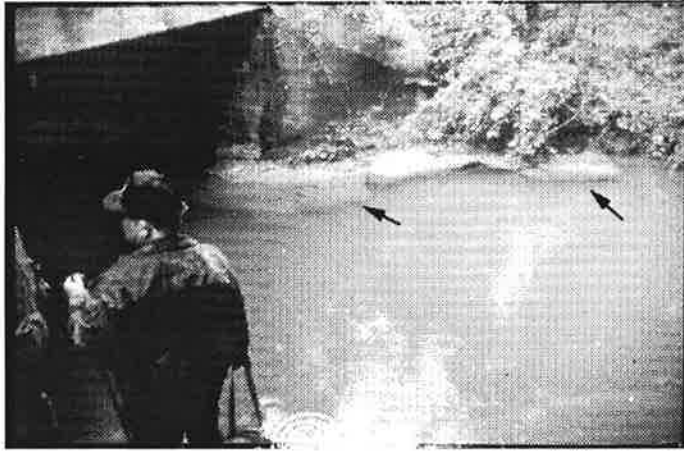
Shows some undercutting of grout bags at ends and sides.
